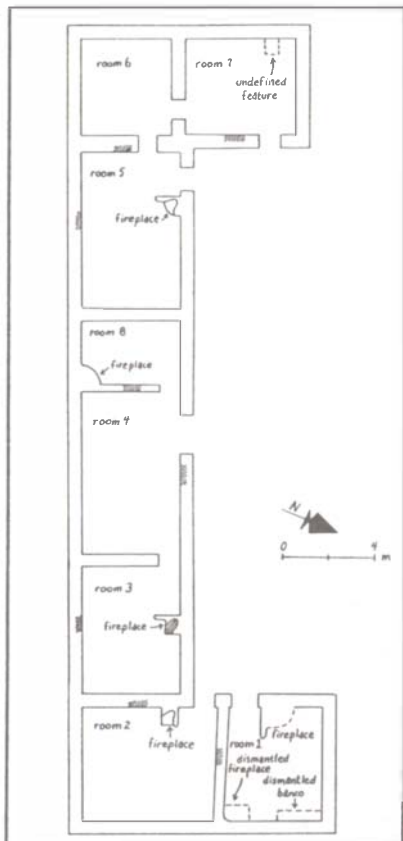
Plan view of the Trujillo House showing features and adobe collection locations (//////).
